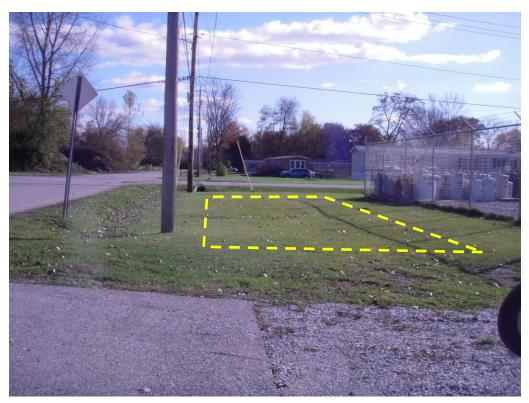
A large unused portion of greenspace in front of the electrical substation could be utilized to treat stormwater runoff from the substation and adjacent town properties.
